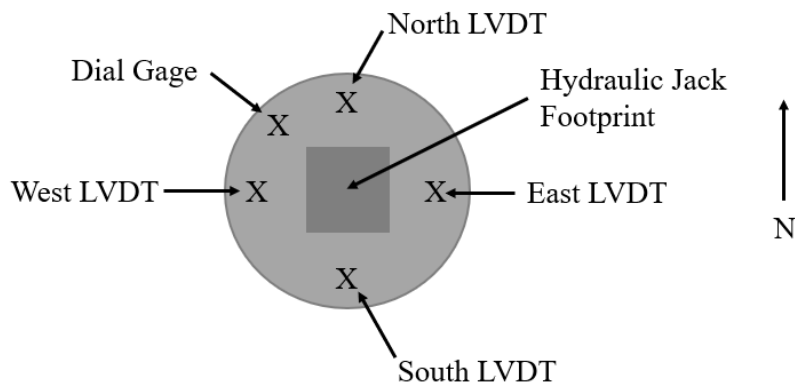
Schematic showing the LVDT and dial gage placement on the top of the model foundation in a typical test
